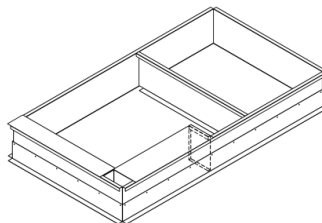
Example Adjustable Pitch Solid Bottom Curb
